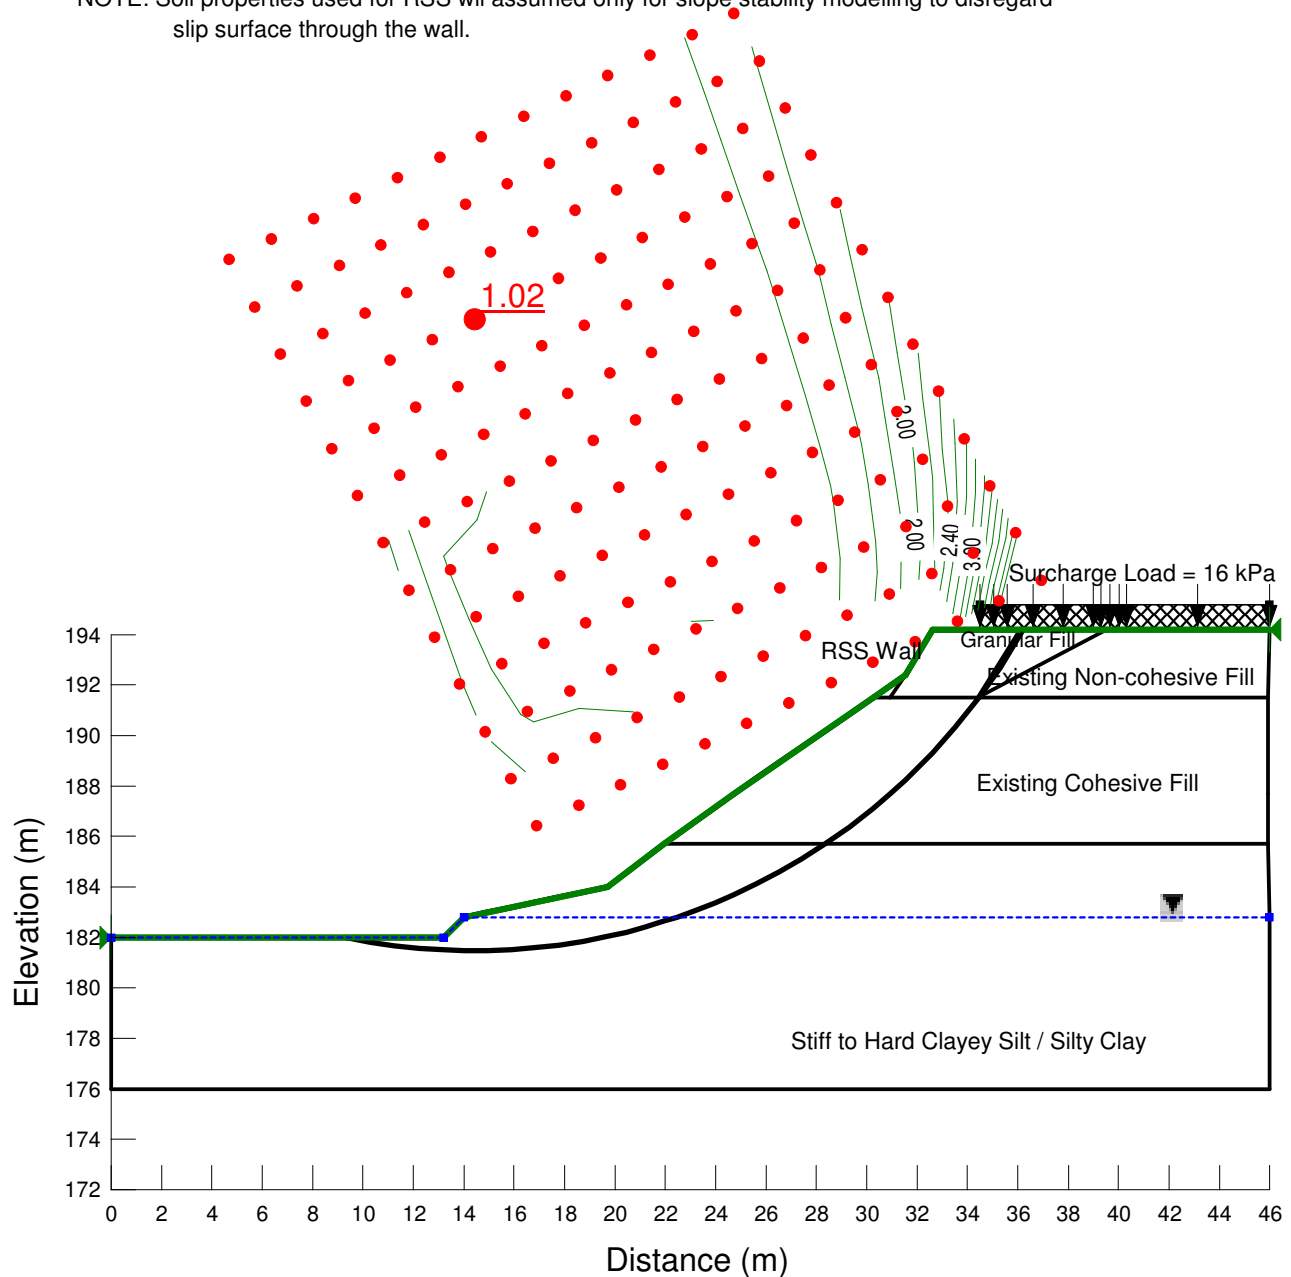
Slope Stability Analysis including Proposed RSS Wall, beside Culvert - Sta. 15+205
